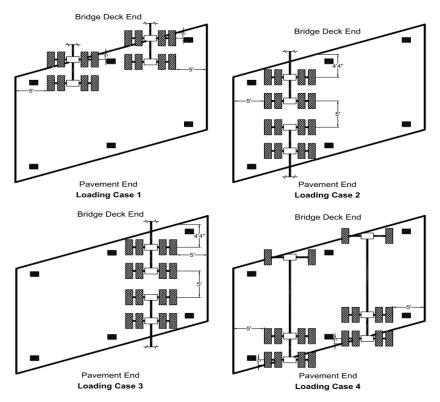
Load Cases and Truck Locations for Bridge A7767
